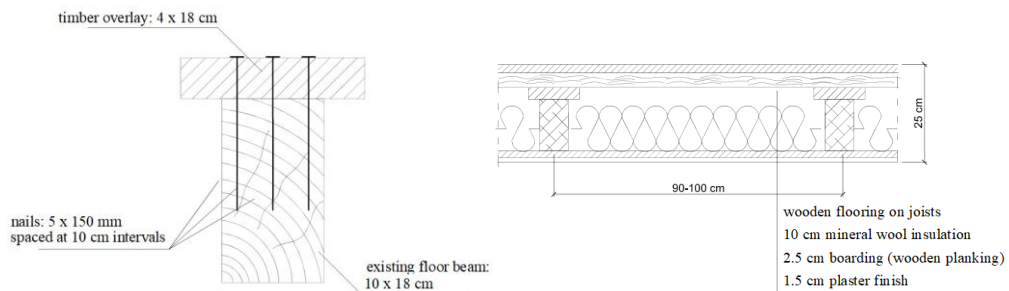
Method of strengthening the ceiling beam above the upper floor
